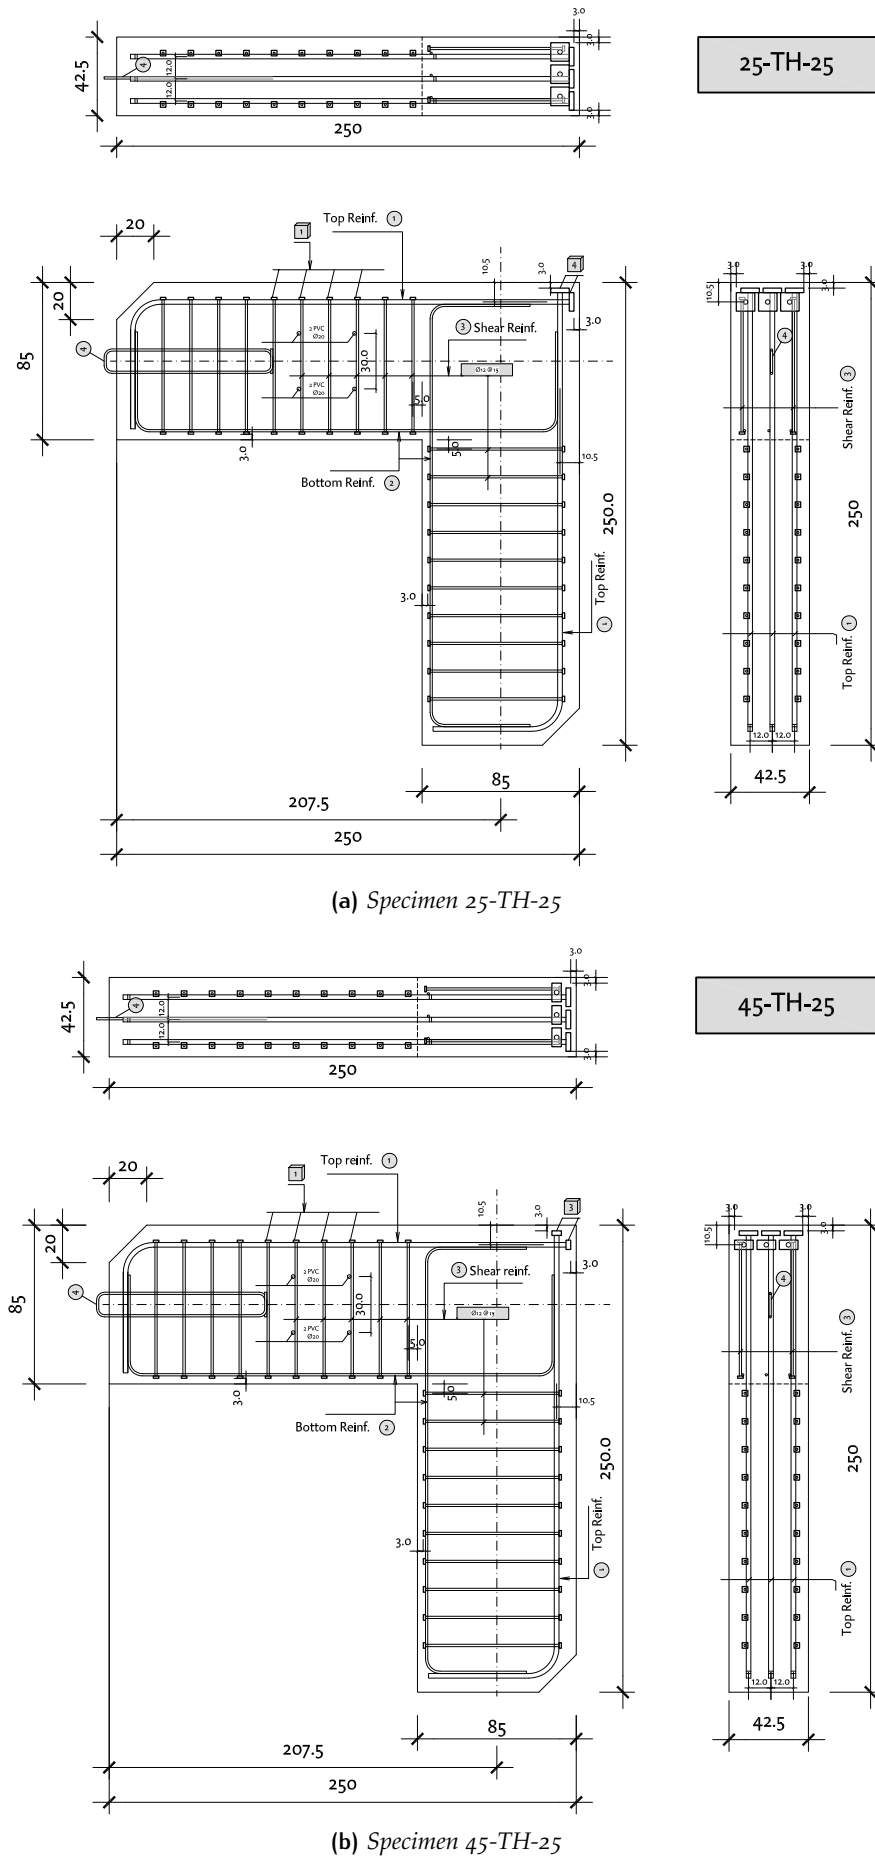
Drawing details of the headed bar specimens with 25 mm rebars
